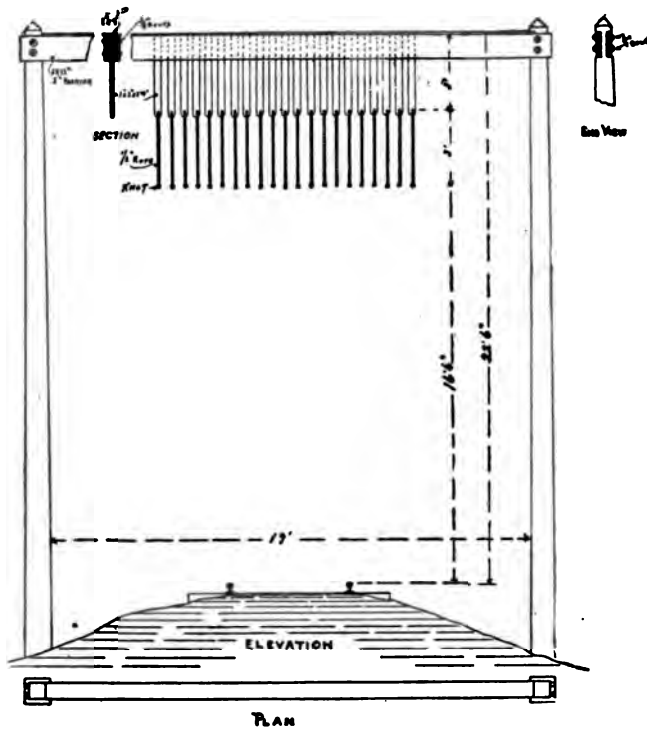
BRIDGE WARNING, WABASH R. R. (PLAN NO. 2.)—CONTINUED.
